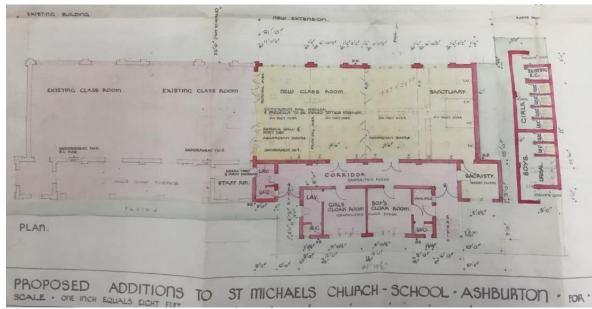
Detail of plans for the extension by Robert Ellis show the building continued to be a multi-purpose school and church in 1945, with folding concertina doors to divide the building into classrooms. (Source: Public Records Office of Victoria VPRS 7882/P1/909, file 7710)
